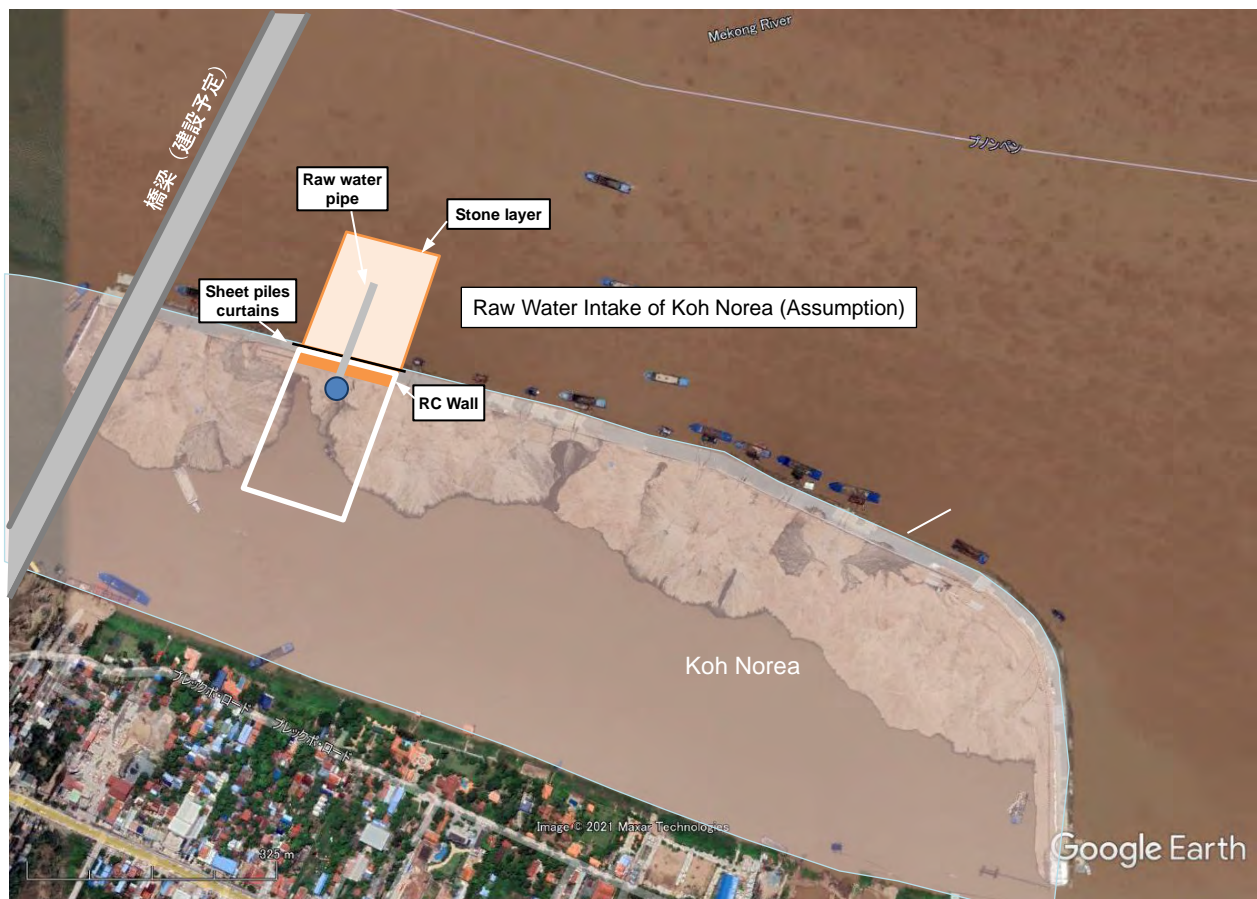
Outline Plan of Proposed Protection of Revetment and Riverbed for Nirodh Phase III and Koh Norea
